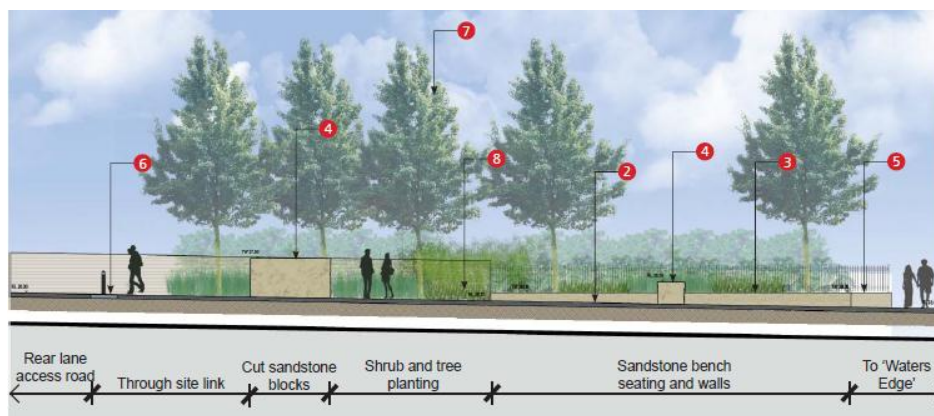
Indicative cross-section of Radcliffe Place Through Site Link
